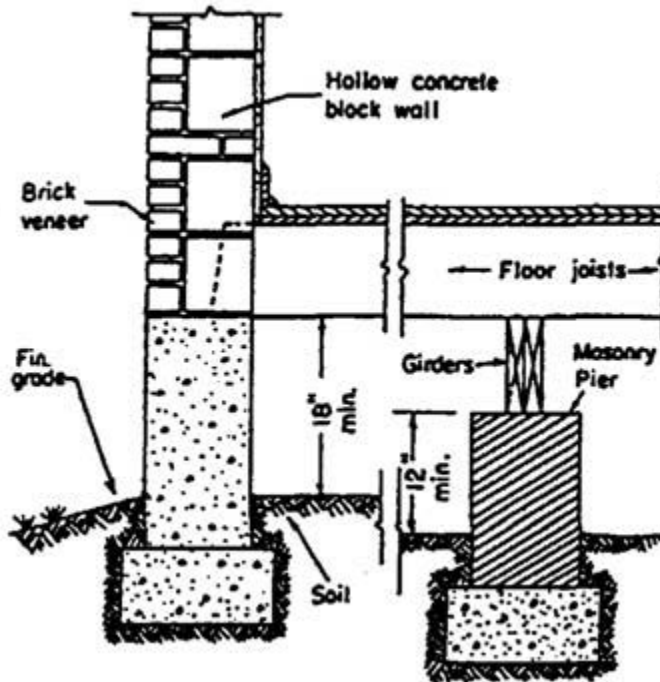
Adequate clearance should be provided between wood and soil both outside and inside the building.
